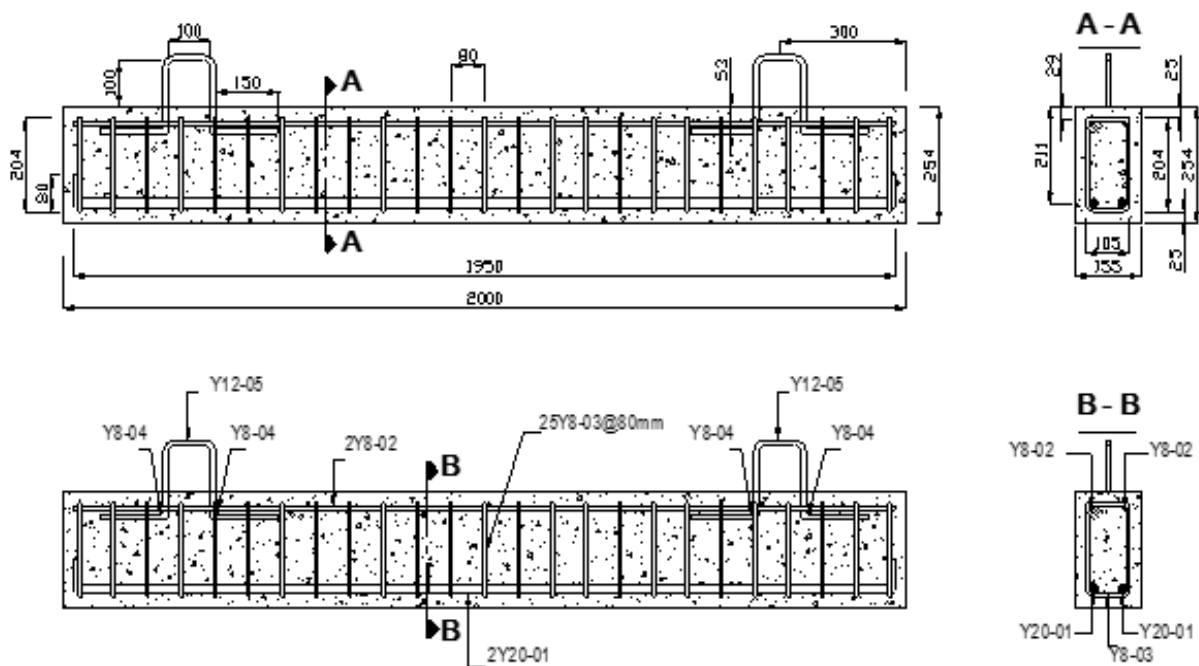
Reinforcement layout and dimensions details of RC beam specimens.
